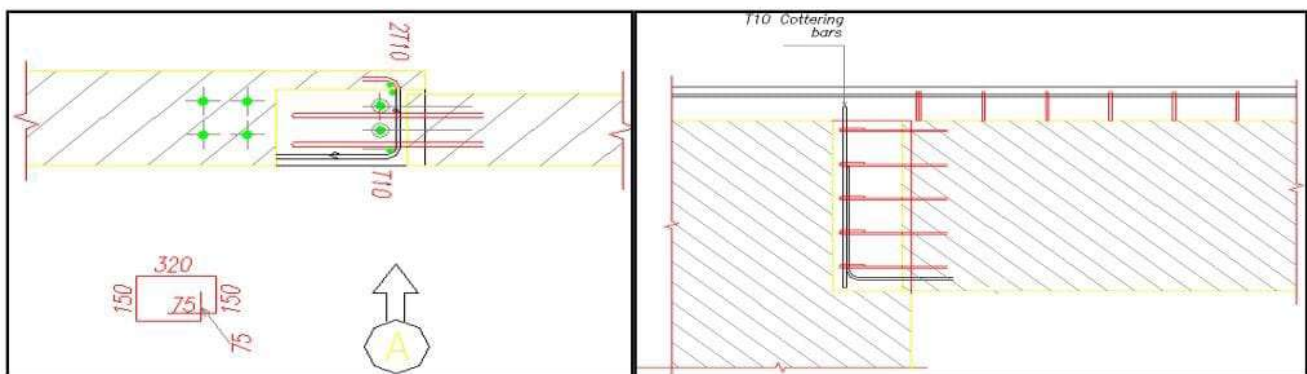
Detailing Interior wall to beam connection having loop bars with cottering bars.
